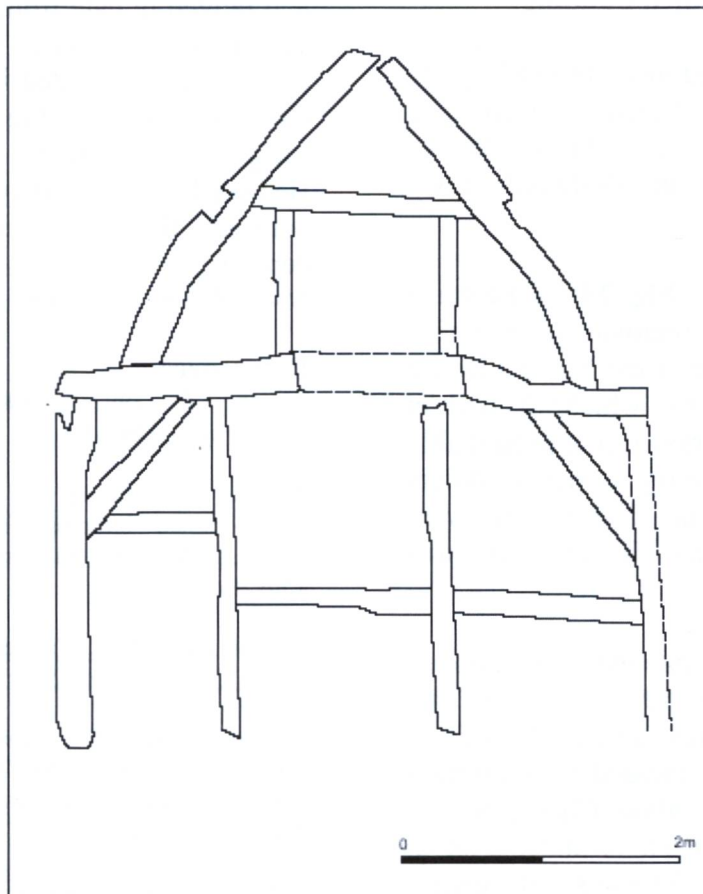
Computer-rectified drawing of medieval timber frame, Chapel Street, Bedworth (drawing by M Planas)
